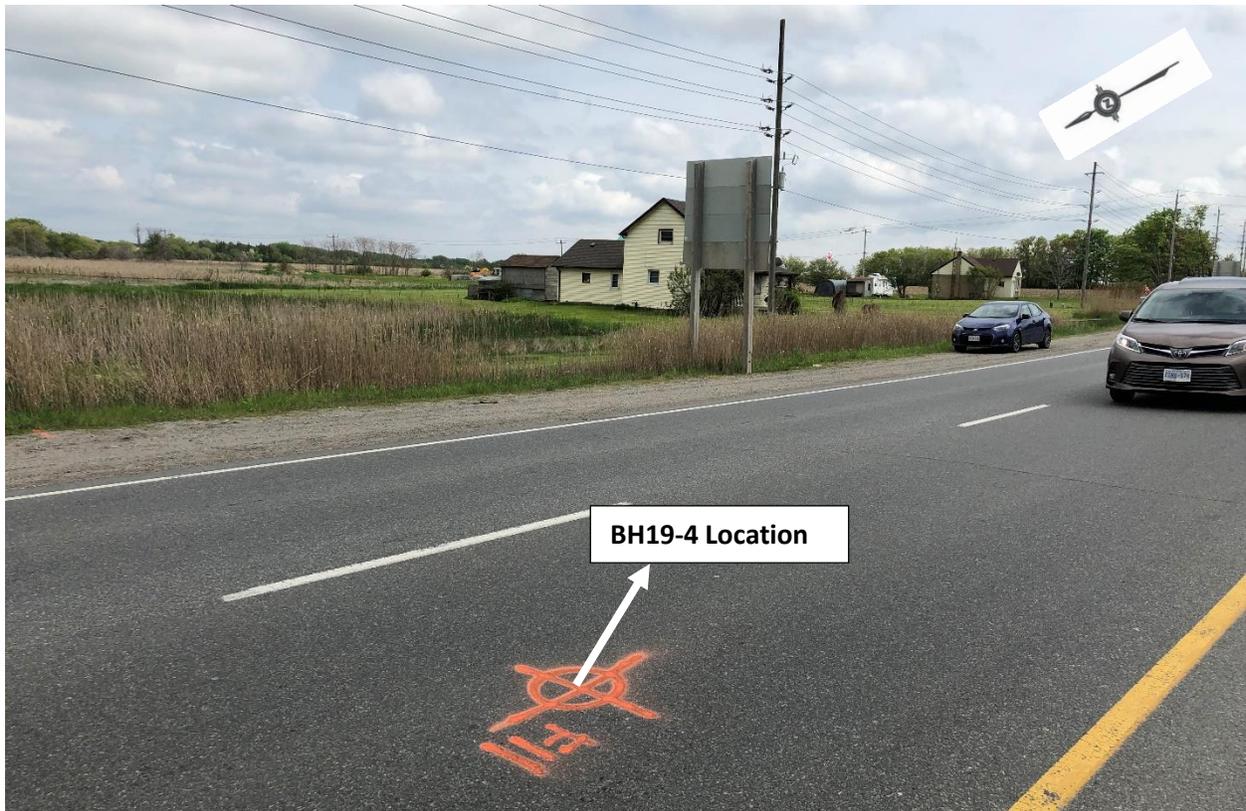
Looking towards South near culvert Sta. 24+114 (June 2019)
